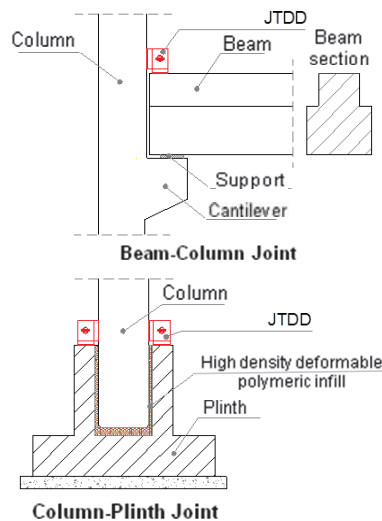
Installation example of the JTDD in the beam-column joint and in the column-plinth joint.
